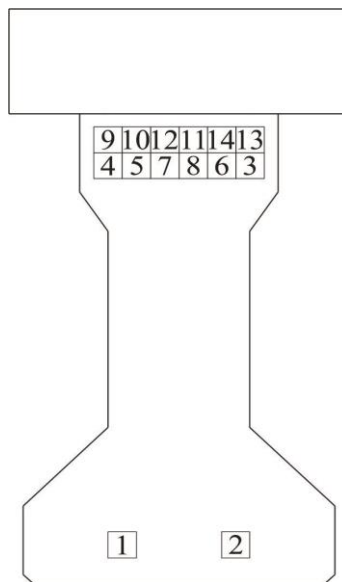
Prestressing strand jacking sequence for NB precast beams
